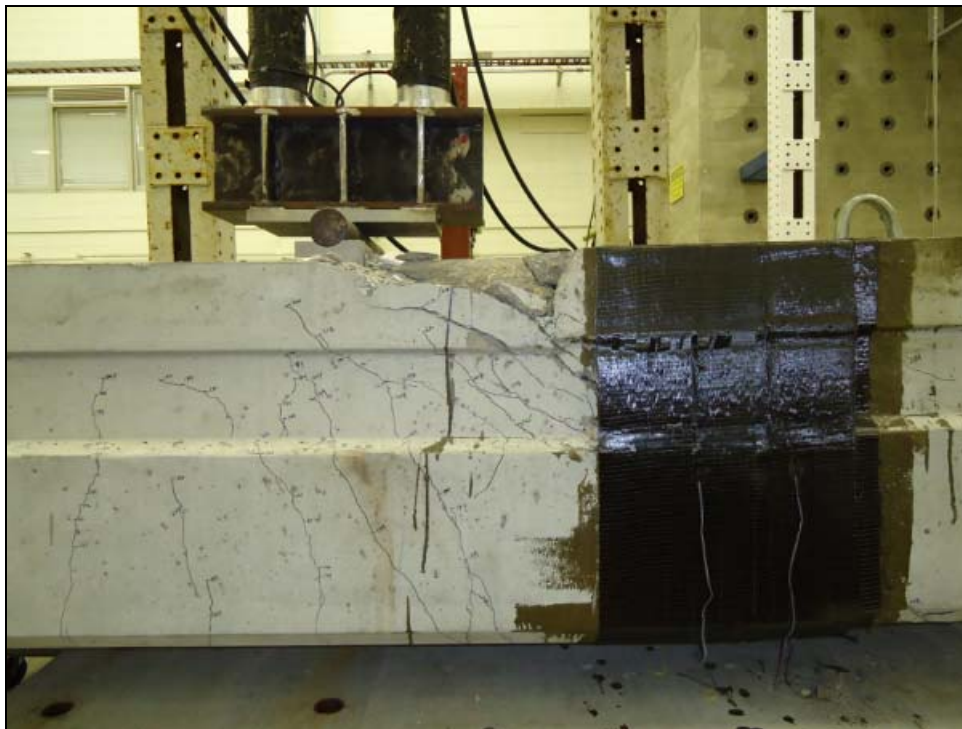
Crack pattern after failure for Box-2, South End, Side A.
